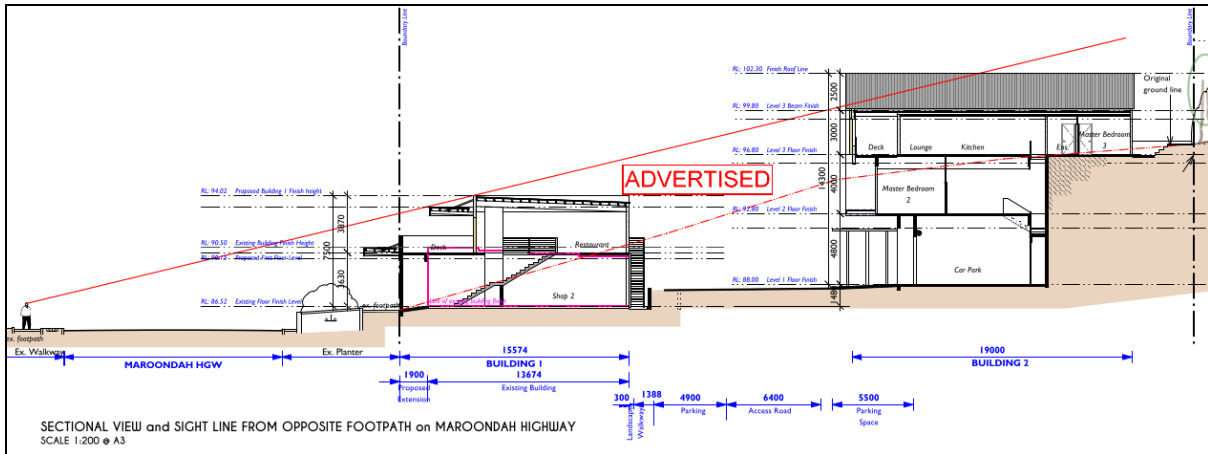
Sectional View showing Sight Line View from Maroondah Highway
